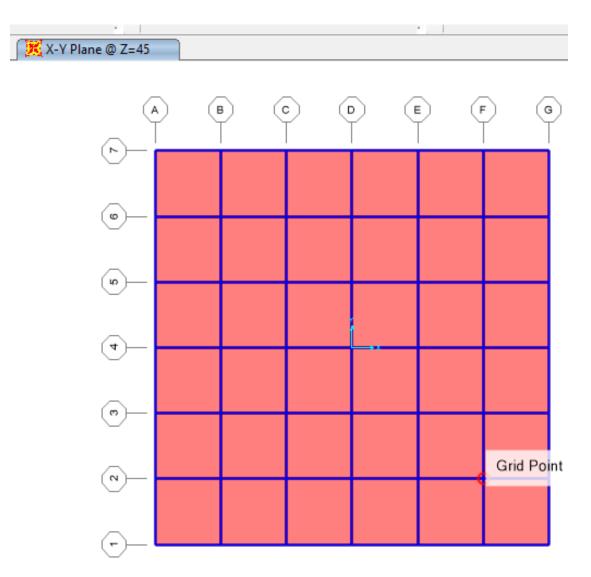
(a) Plan of setback model 1 (square type) up to 45m height.
